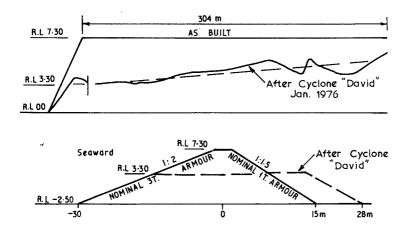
DAMAGE TO ROSSLYN BAY BREAKWATER
